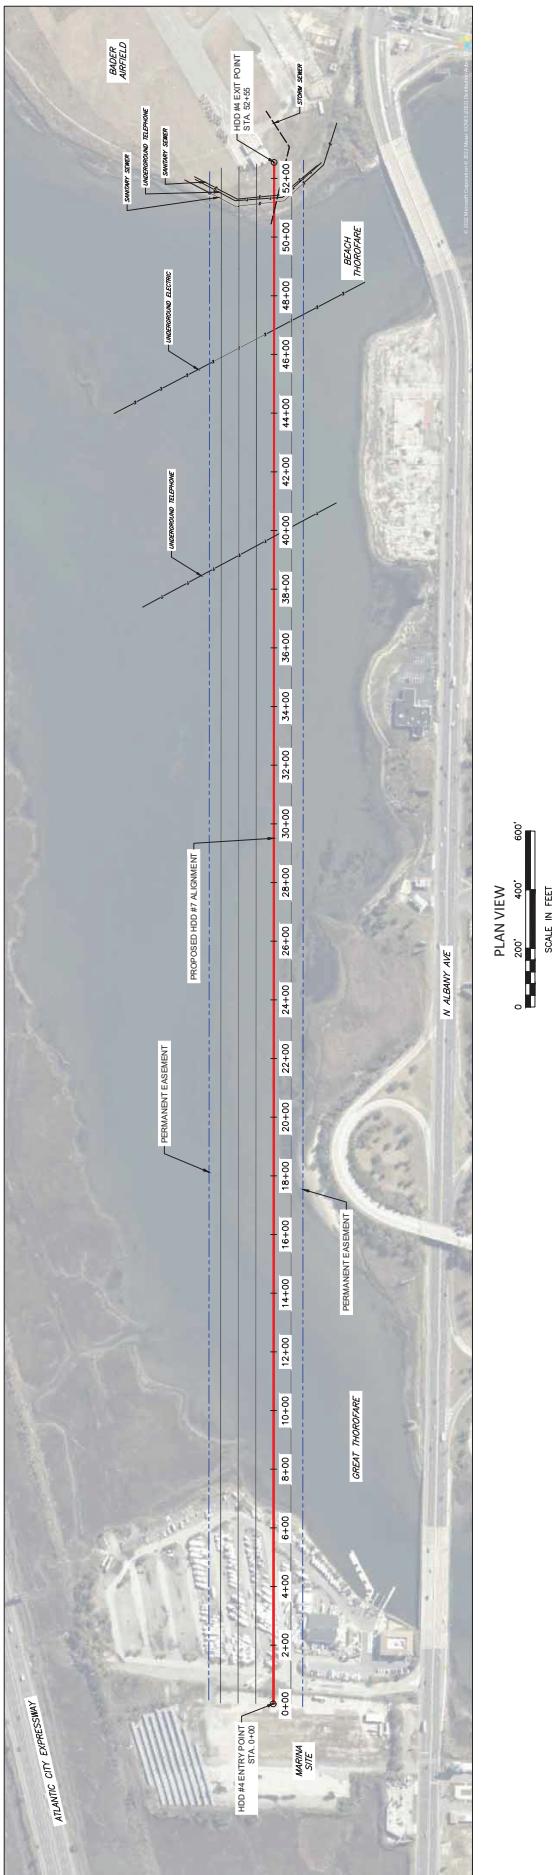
Great Thornton Crossing #1 HDD Plan and Profile
